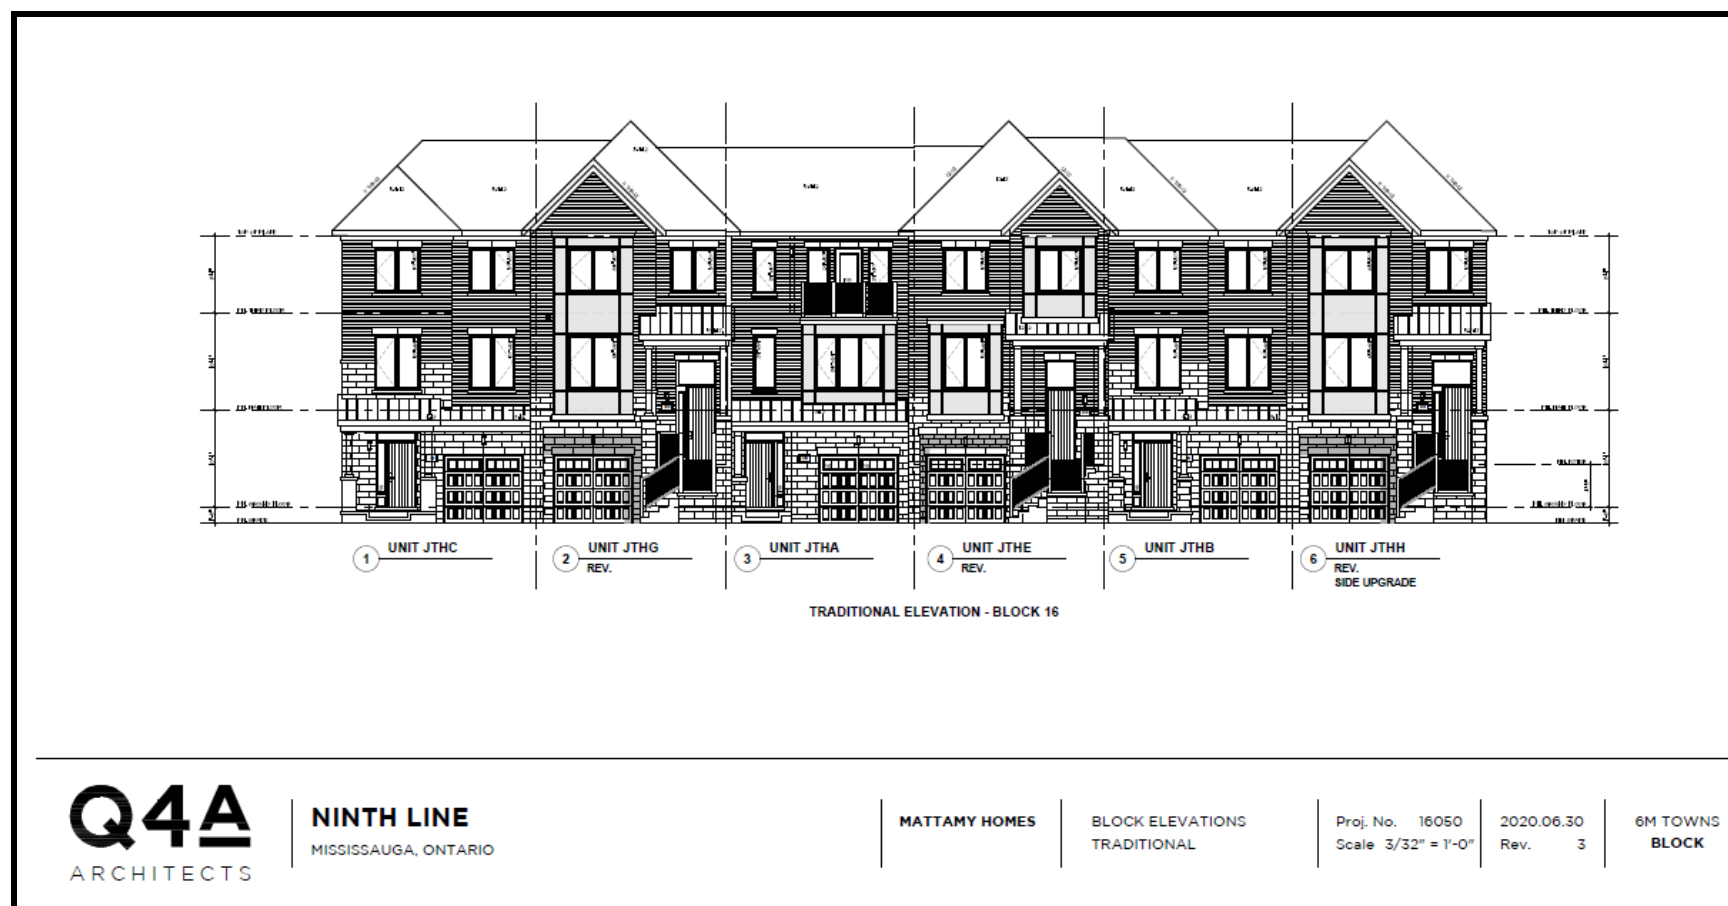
Front Load Towns (Traditional), Block 16 – Front Elevations
